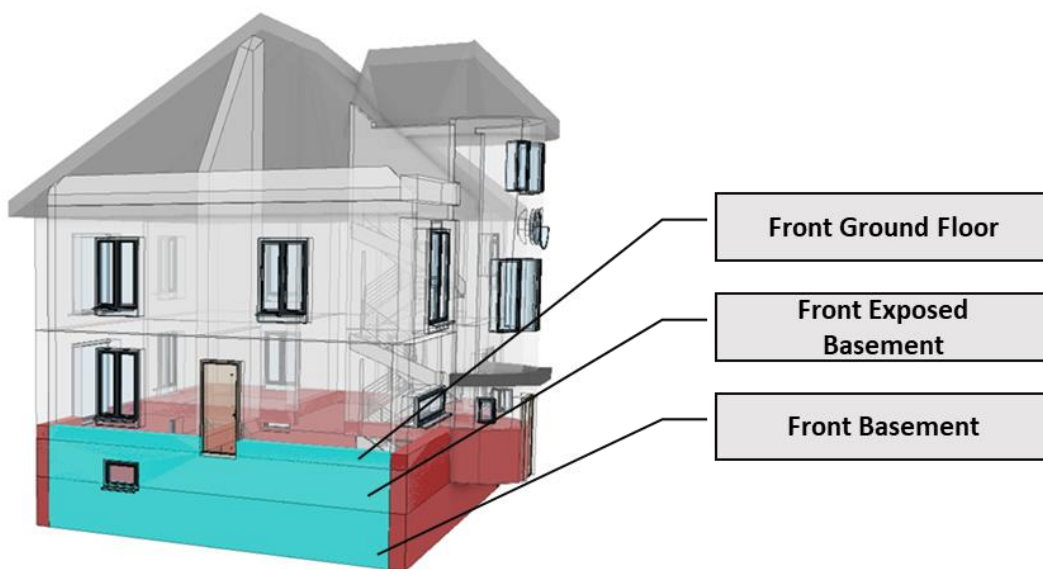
Highlighted frontal side (upstream side) flood intersected components (walls, ventilation, and door)
